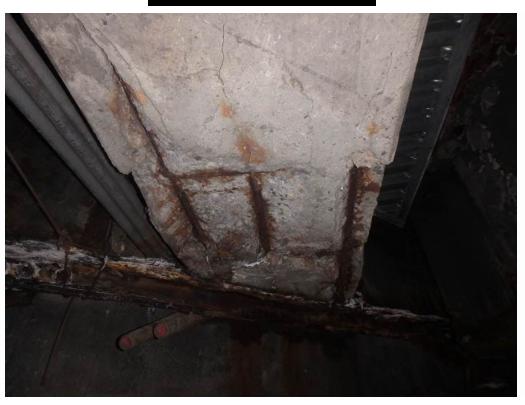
The concrete encased utility in bay #7 has moderate spalling with exposed rusted rebar to the bottom face over the south abutment in span #1
